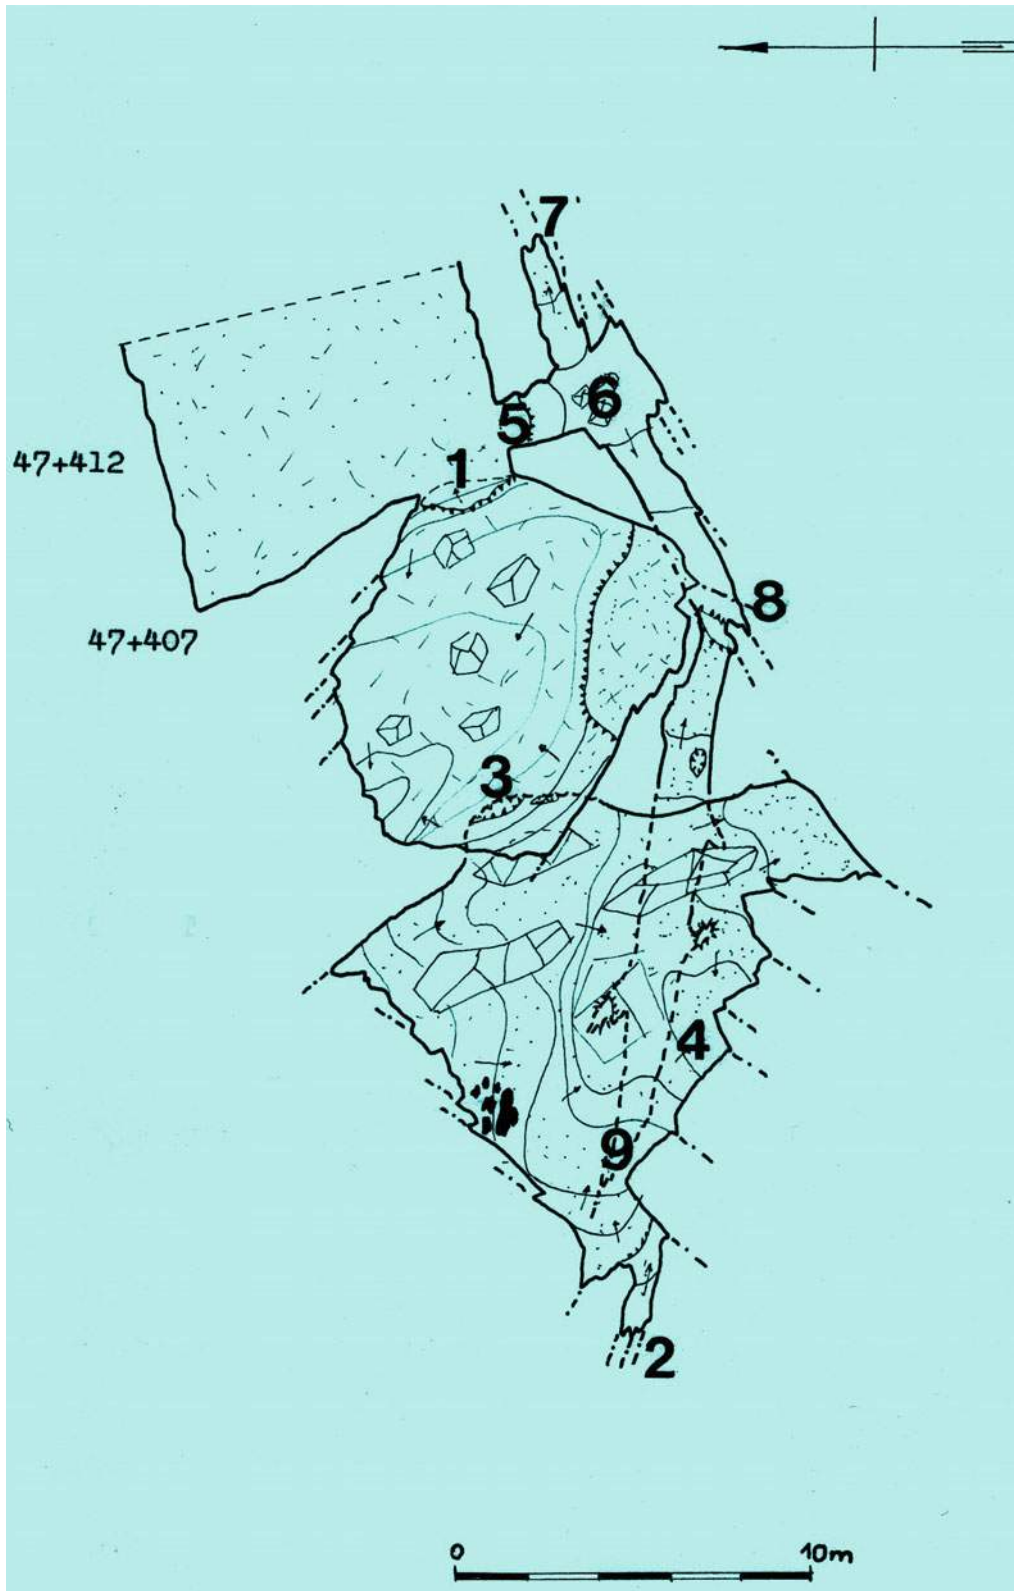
Plan of cavern at km 47 + 407 in Vršek Tunnel
